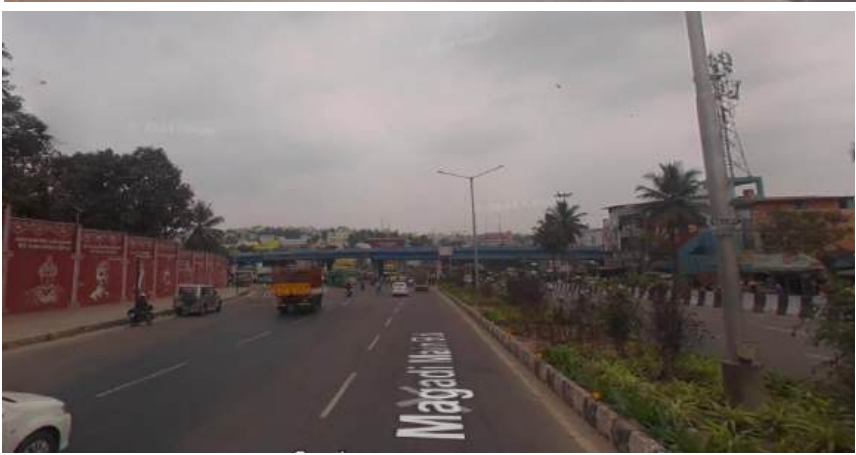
Proposed Double Decker Corridor from Hosahalli to Kadabagere cross near Seegehalli along Magadi road
